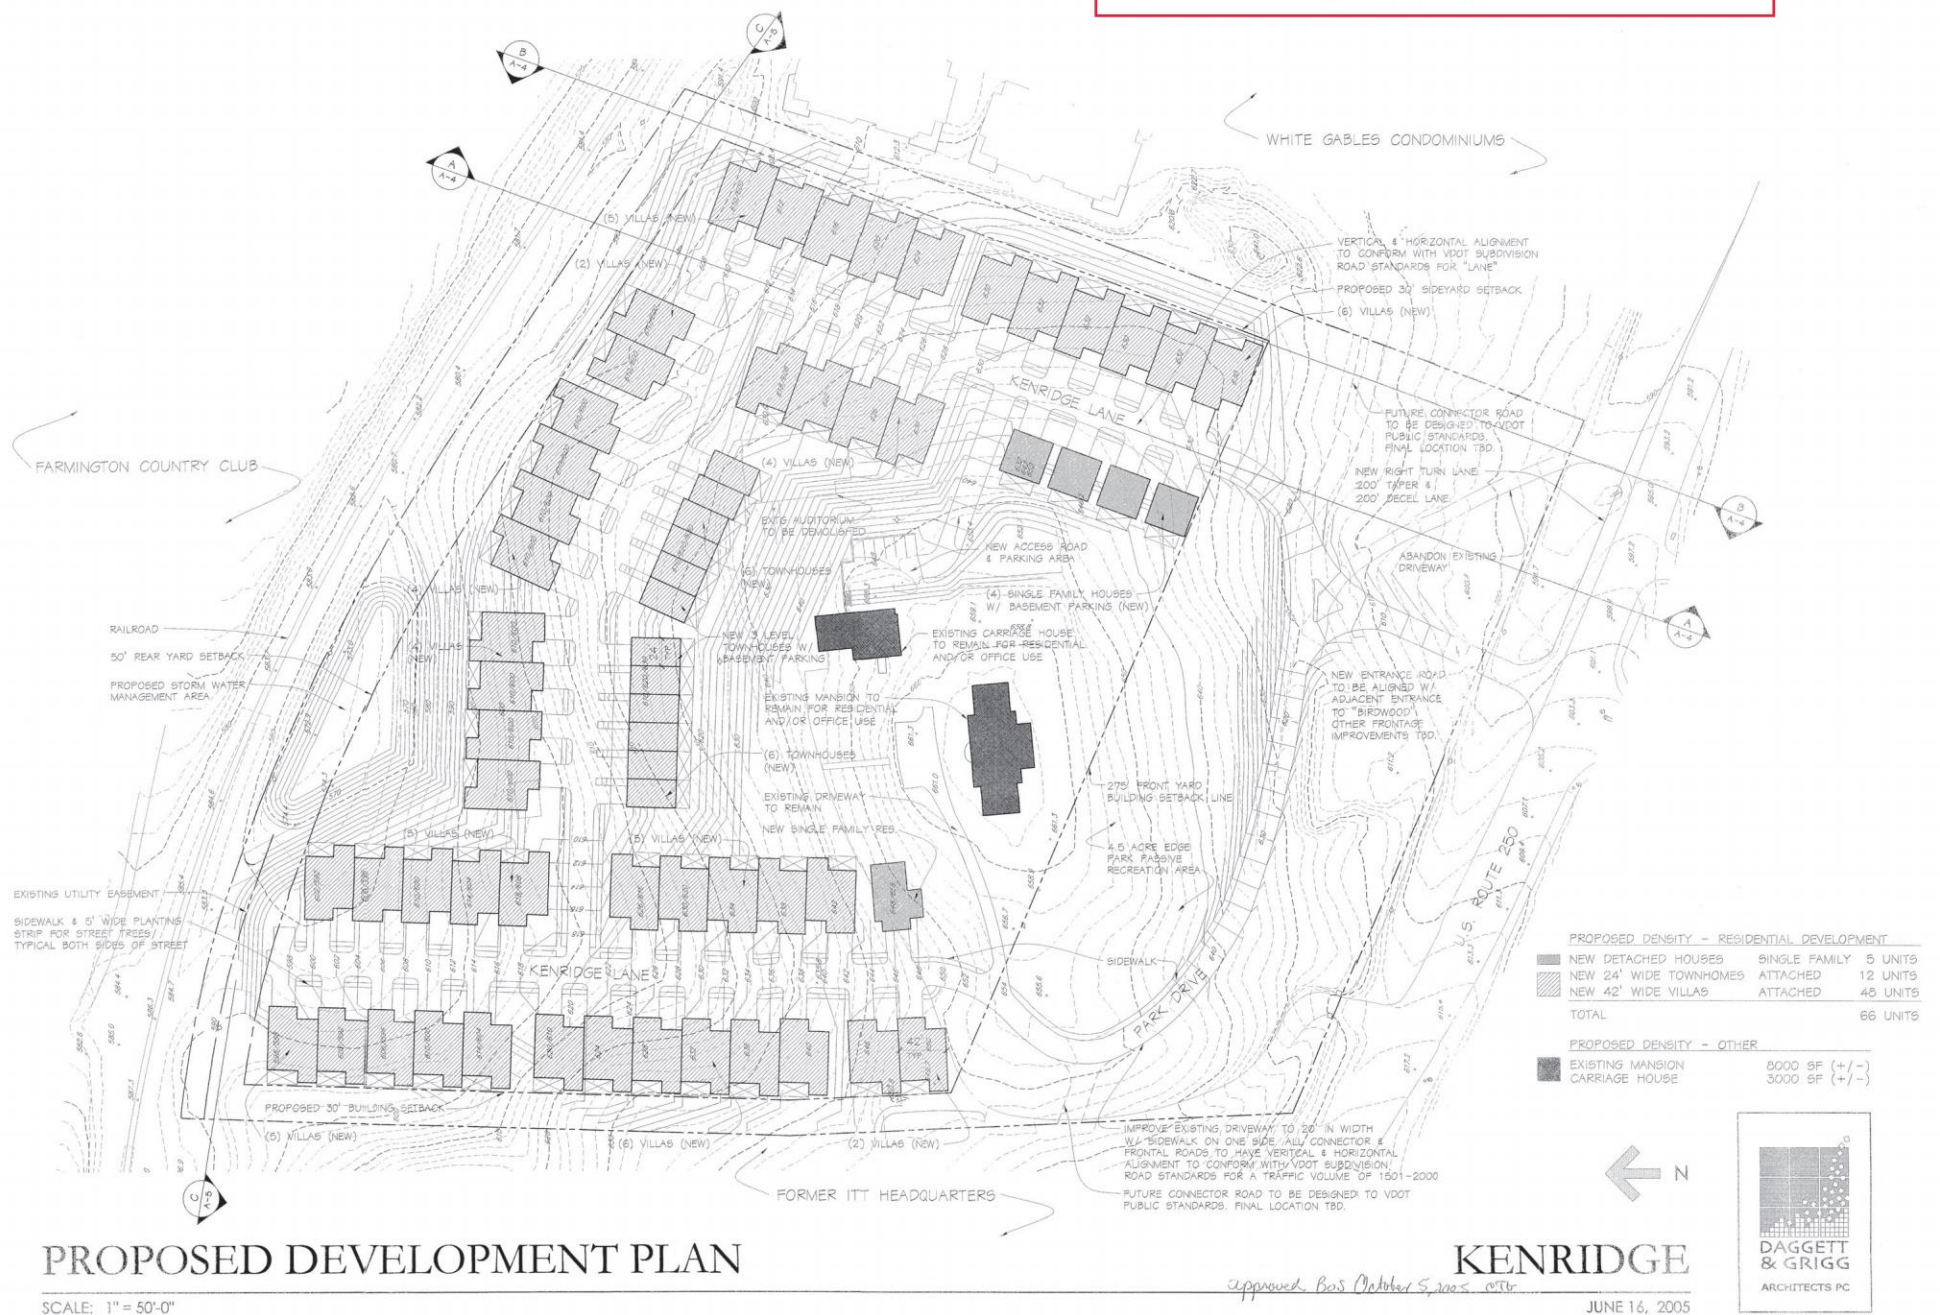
APPROVED APPLICATION PLAN WITH SP2004-52
